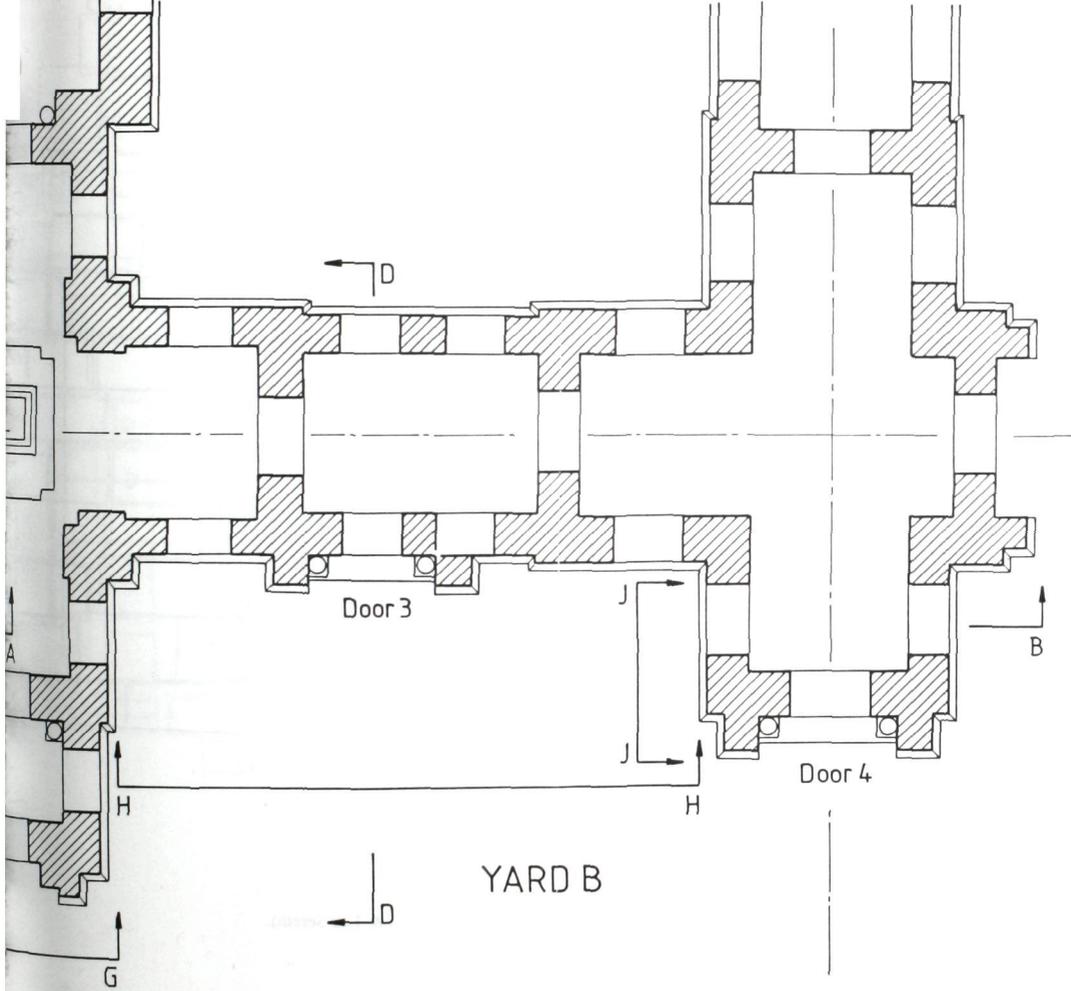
Plan of the west end of the complex, showing the location of elevation drawings, sections and scaled photographs.
